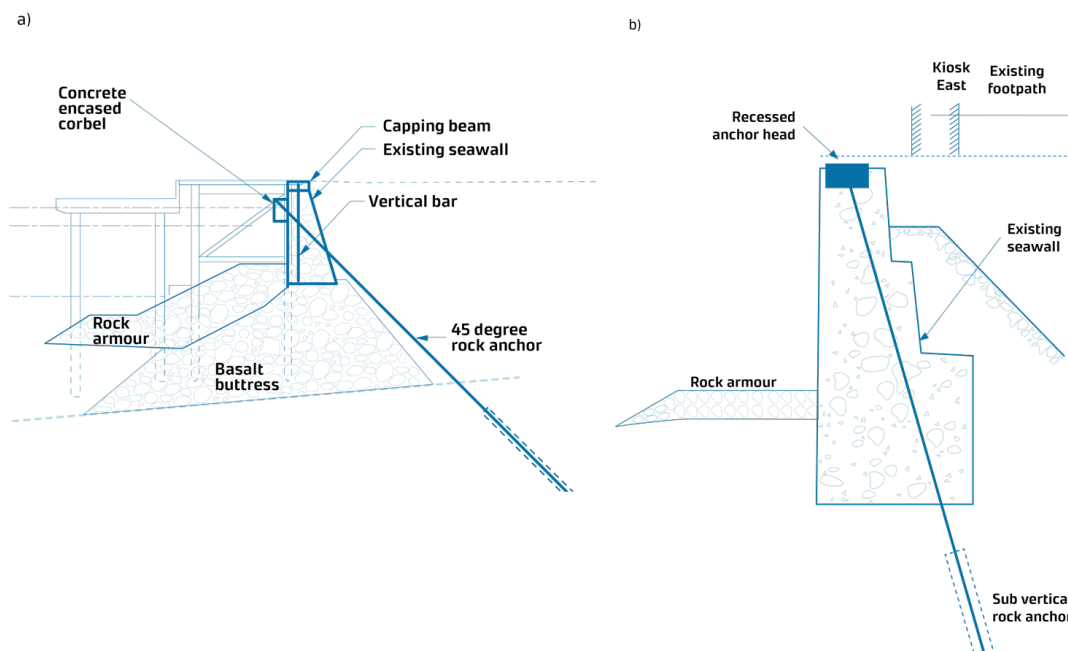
Cross sections of the a) Ferry Basin, and b) Ferry Building seawall anchoring solutions.
